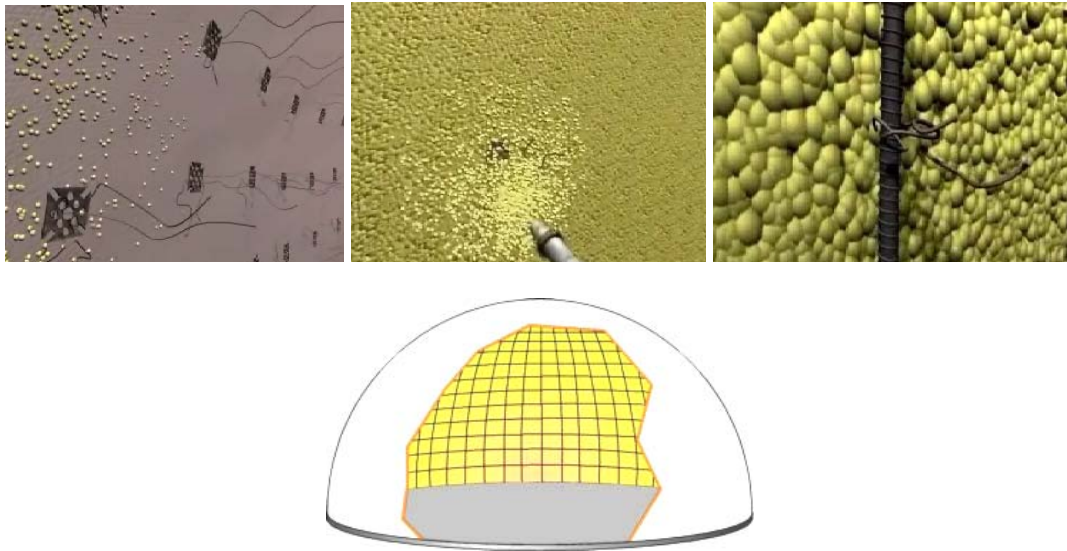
Building a Monolithic Dome. Step 4: Steel reinforcing.
